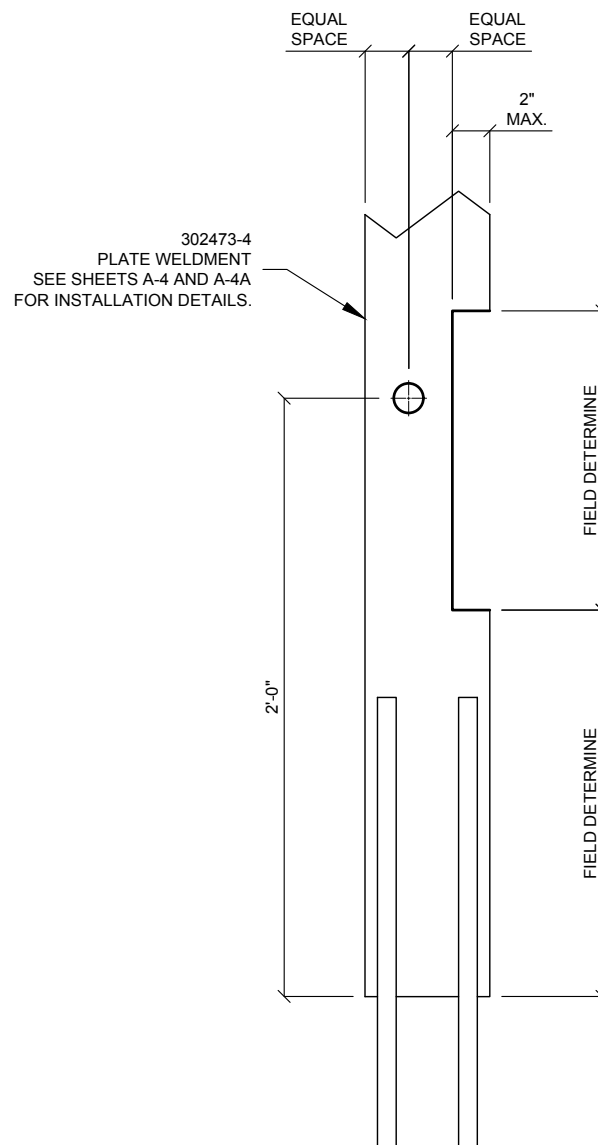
PLATE WELDMENT INSTALLATION DETAILS (CONT'D)
